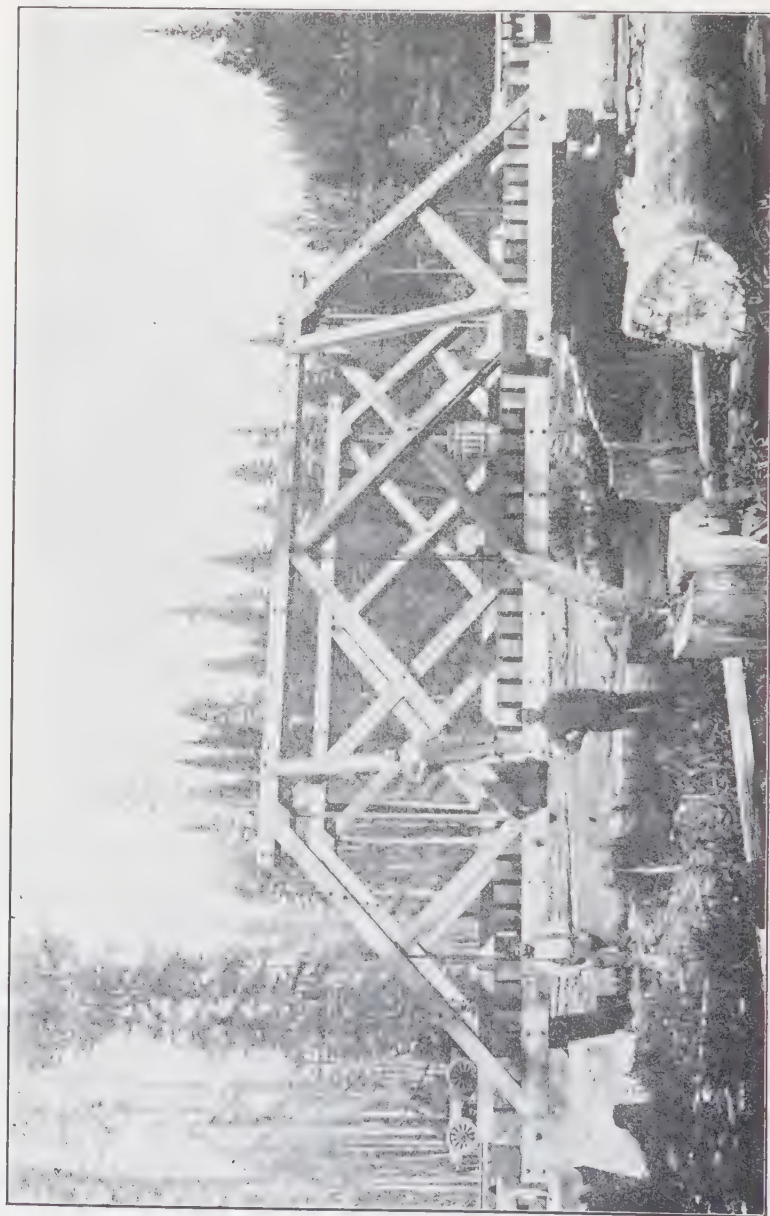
d*.—Pony Howe-truss Bridge at Crow's Nest Line, Canadian Pacific Railway. Span 50 feet.
